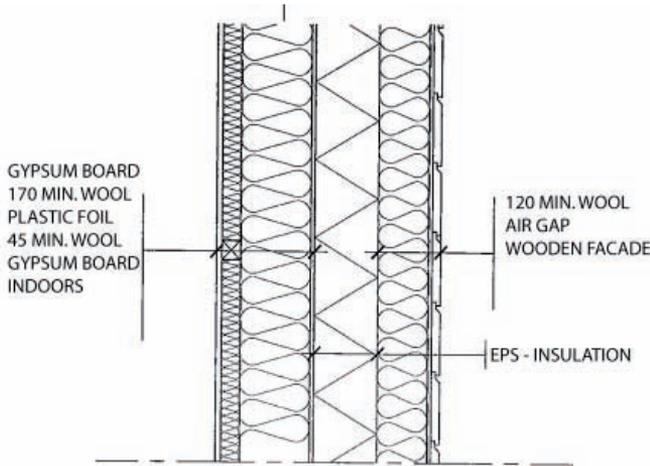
Outer wall construction (Drawing: Vårgårdahus).
